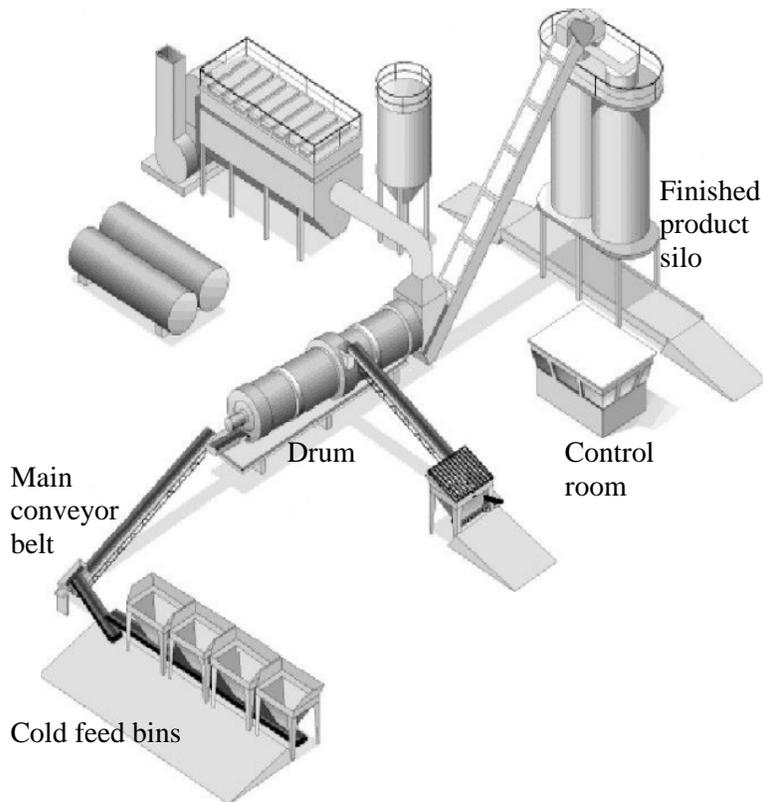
A typical drum asphalt plant (Washington Asphalt Pavement Association Inc, 2002)
